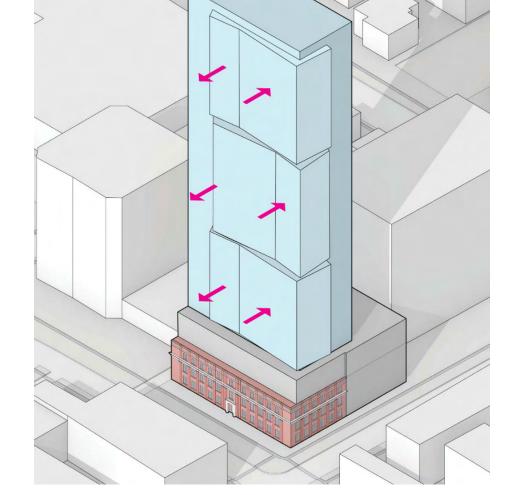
Conceptual massing of the Proposed Development as seen from Duke Street West and Queen Street North intersection with the retained heritage building at grade. (Source: Design Package, Kirkor Architects, September 2021)
